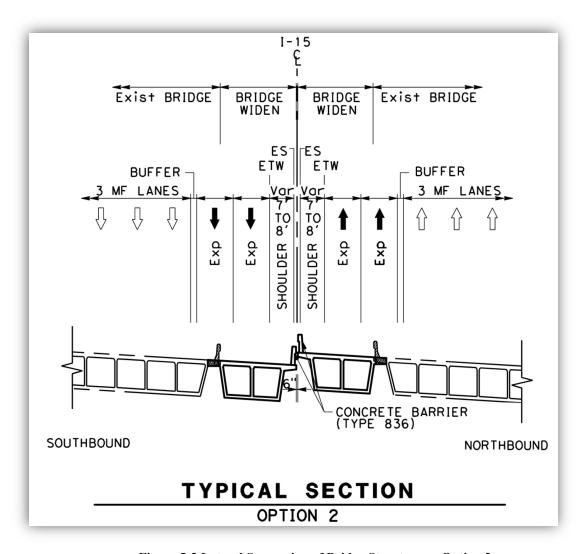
Lateral Separation of Bridge Structures – Option 2
